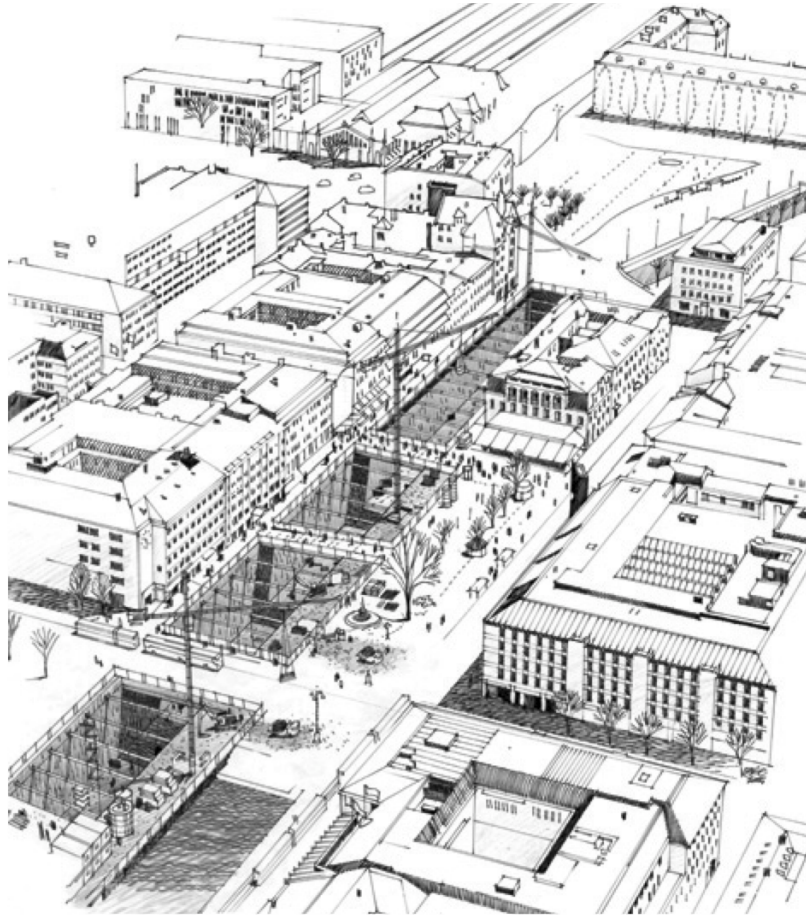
Västlänken, planned excavation at Brunnsparken, Gothenburg, modified from Banverket (2005)
